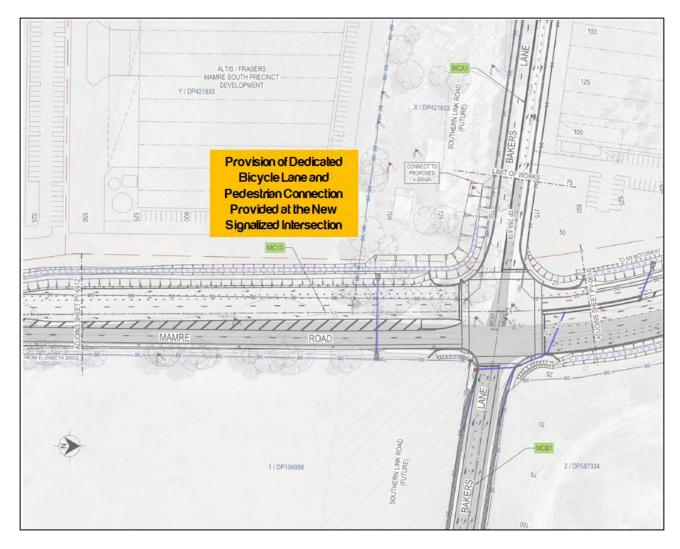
Sequence 1A Signal Layout (Mamre Road / Bakers Lane)
